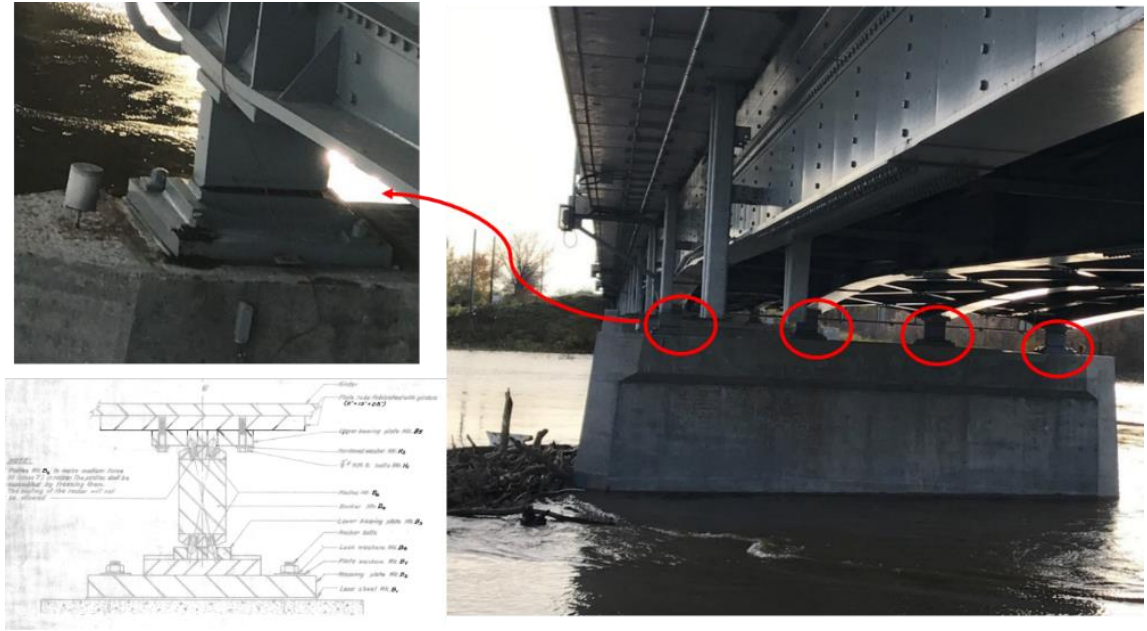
The high type rocker bearing of Pier 5 and its detailed drawing
